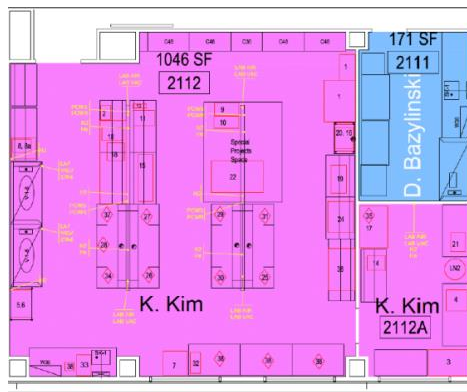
Science and Engineering Building Floor Plan for 2212
